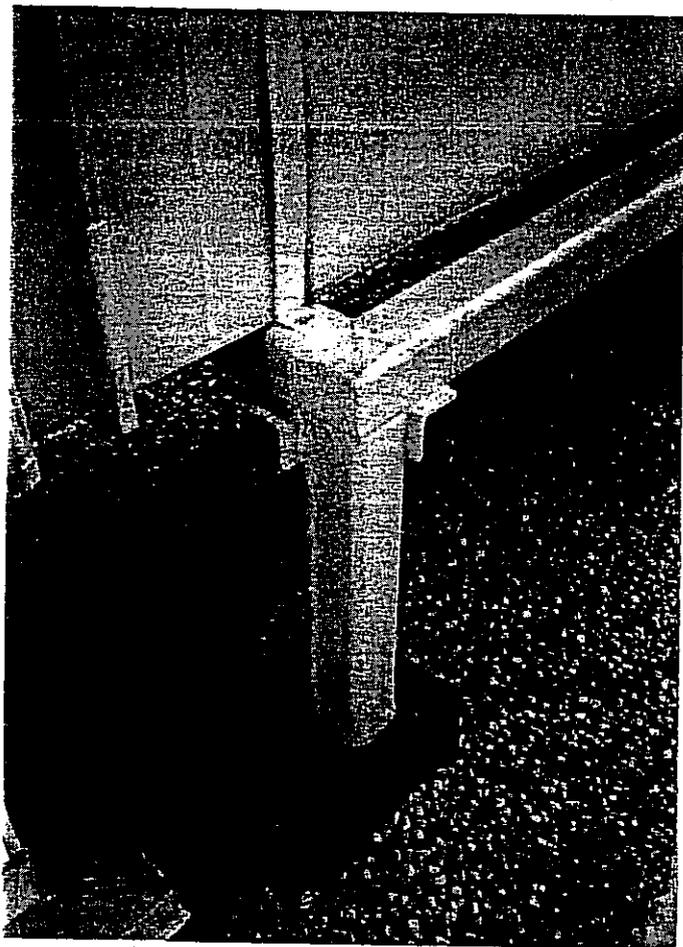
Some equipment supports at the roof level are rigidly anchored to the roof structure. Lateral bracing in both directions is recommended for legs supporting equipment over 18 inches above floor level.
